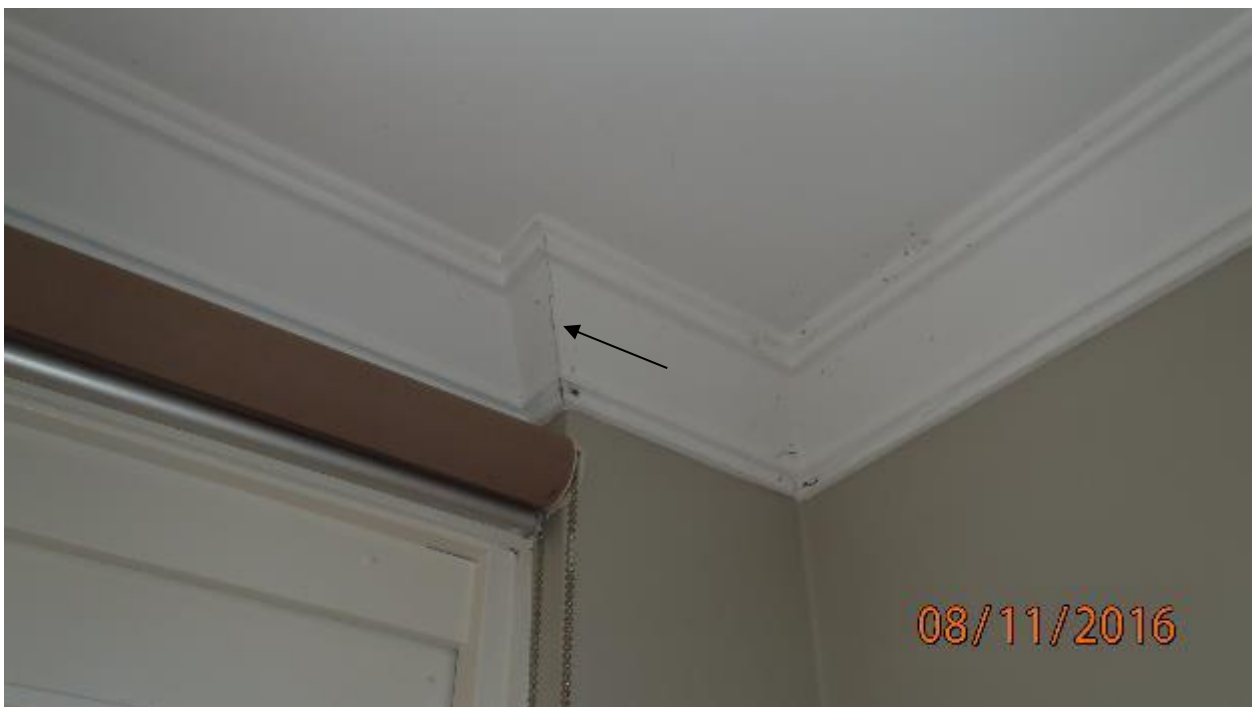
shows cracking to the plaster ceiling lining extending across the Lounge room.
